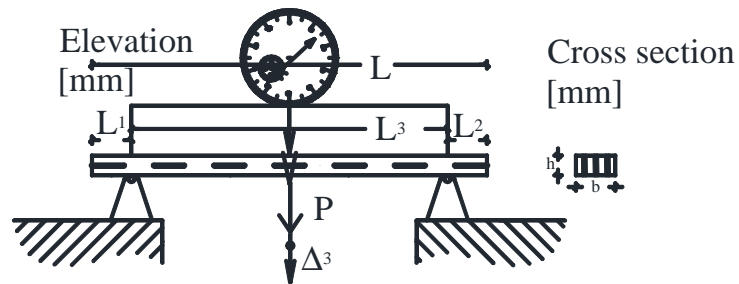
Structural arrangement of a three-point bending test (Lopes, 2013)
